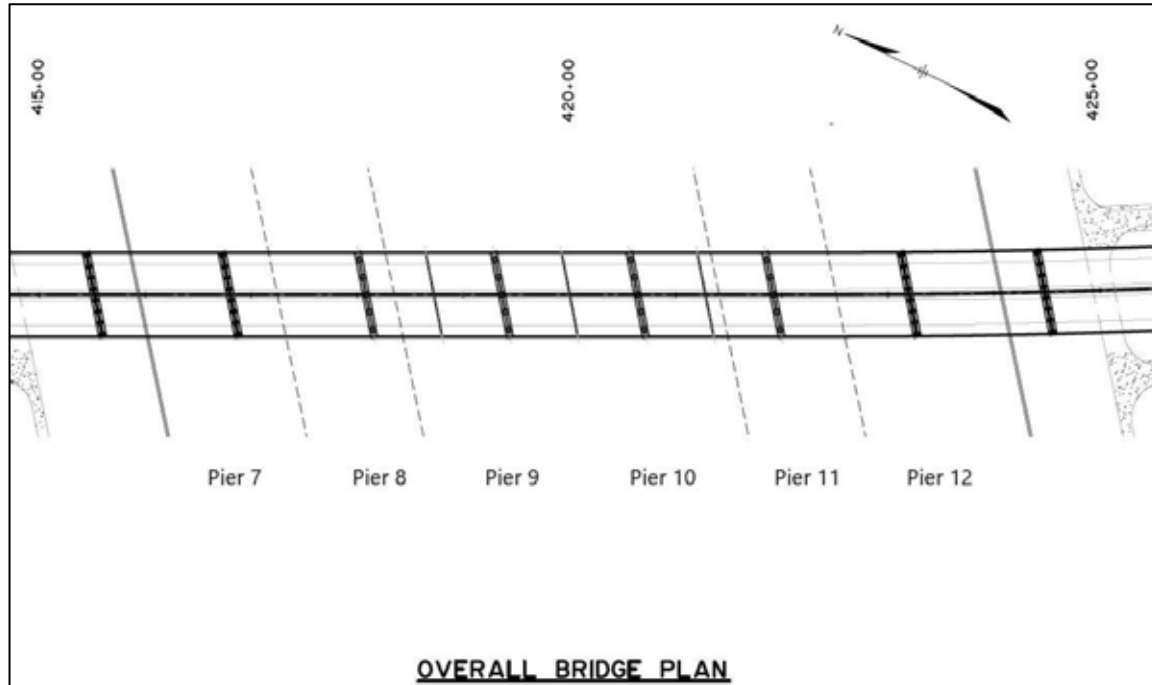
Figure V-III: Proposed Bridge Plan View from 60% Bridge Plans
